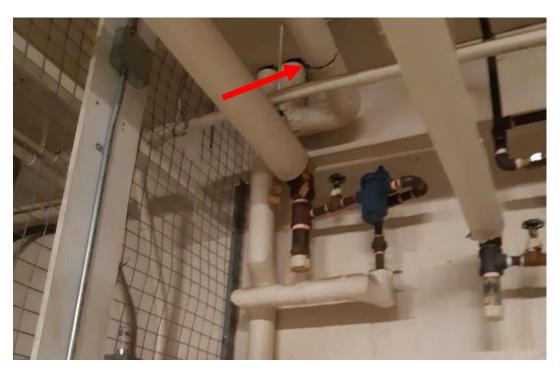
Basement, lab 15, north-west corner of room next to gated area, <1 linear metre fair condition Aircell.
